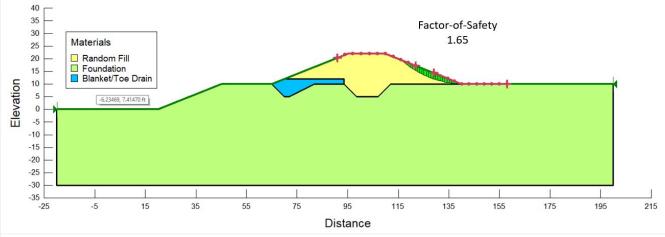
End of construction slope stability for 12-ft-high levee option.
